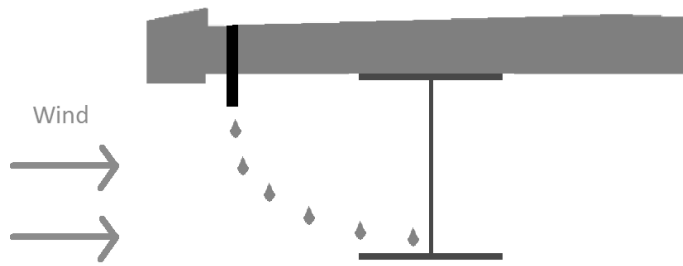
Example of an inappropriate location of the run-off spot for a foundational drainage system. The contaminated water, which can cause damage, is allowed to blow straight onto the steel girders
